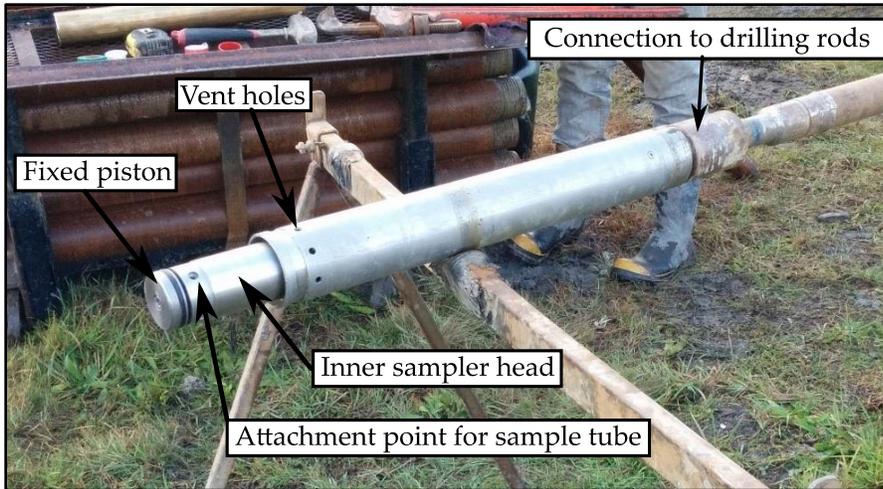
Fully-assembled DM Sampler (shown attached to drill rods, prior to sample tube placement)
